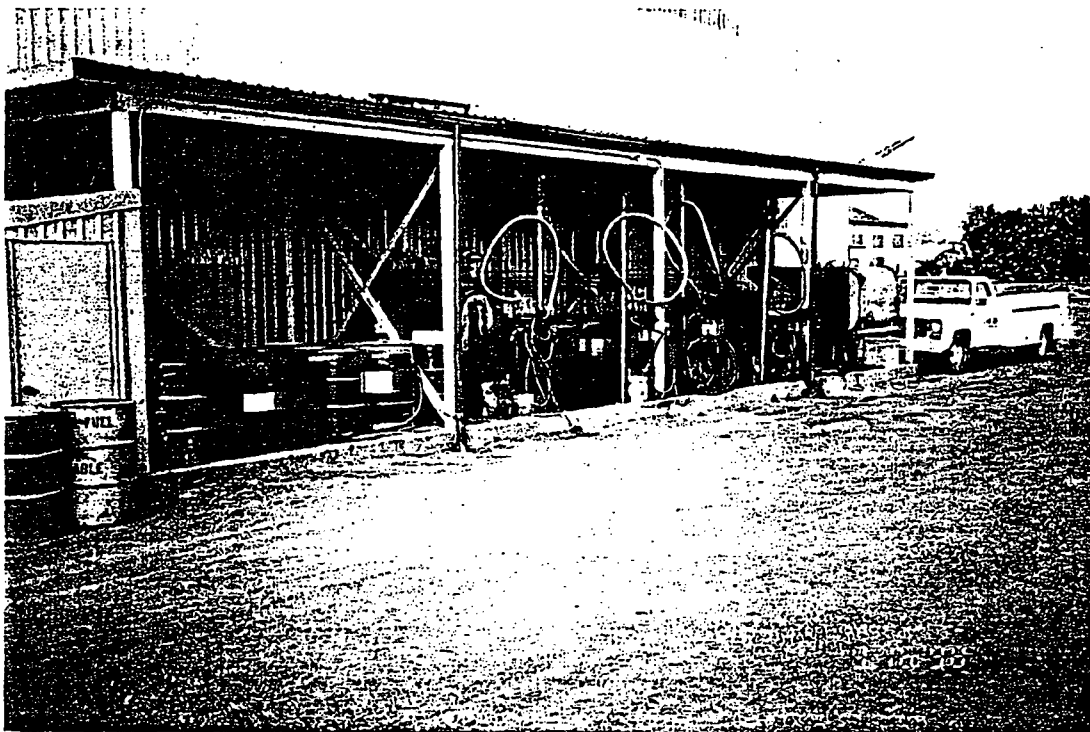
(#3) ABOVEGROUND STORAGE AREA
